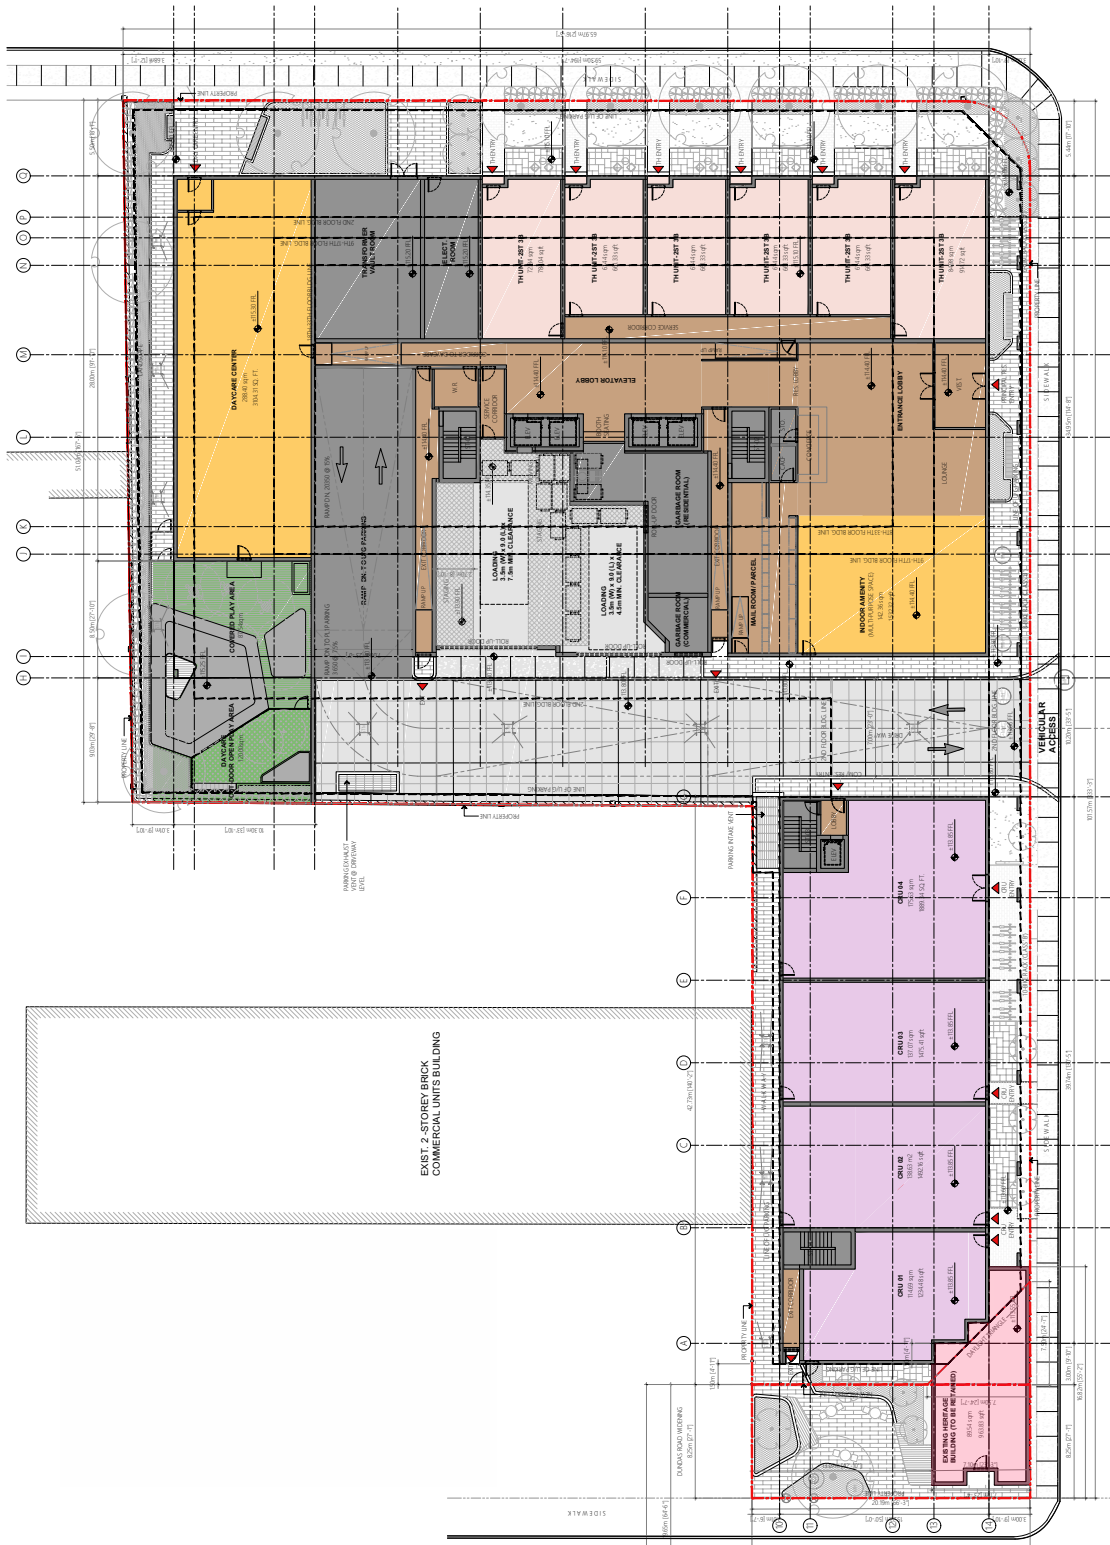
Proposed ground floor plan (RA Lumbao Architects, 2025).
